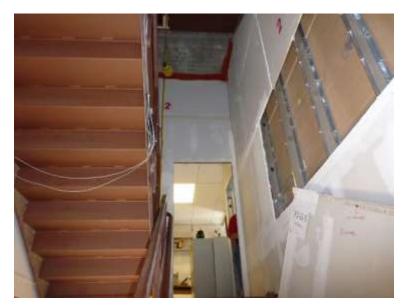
Wallboard detachment following FB-6 around intermediate landing of Floor 1 and 2
